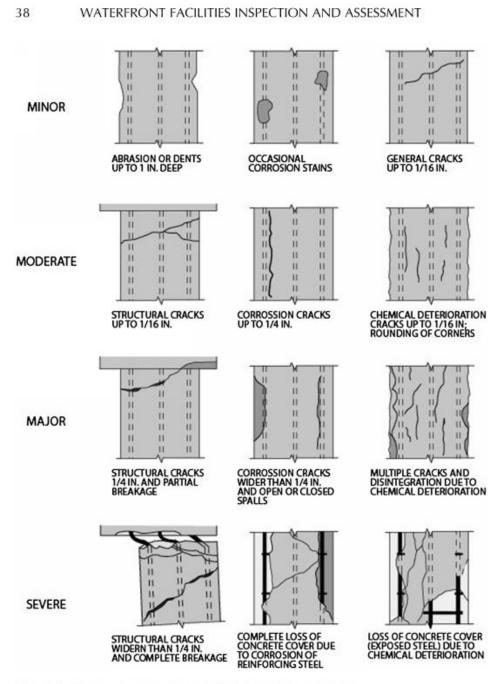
Damage ratings for reinforced concrete elements Source: Courtesy of CH2M HILL, Inc. and COWI, Inc., reproduced with permission.
